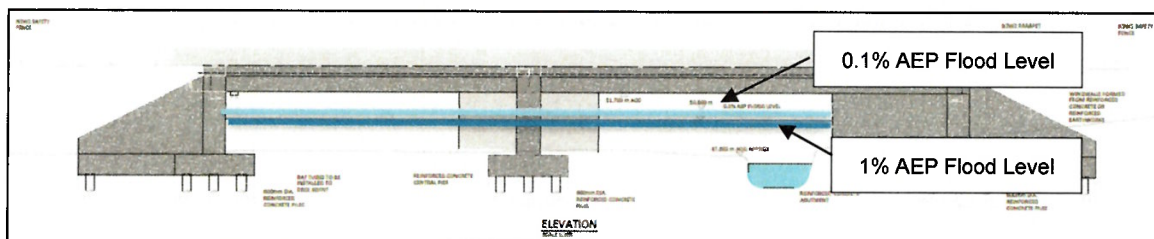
Post-development Flood Levels for Road Bridge 1
